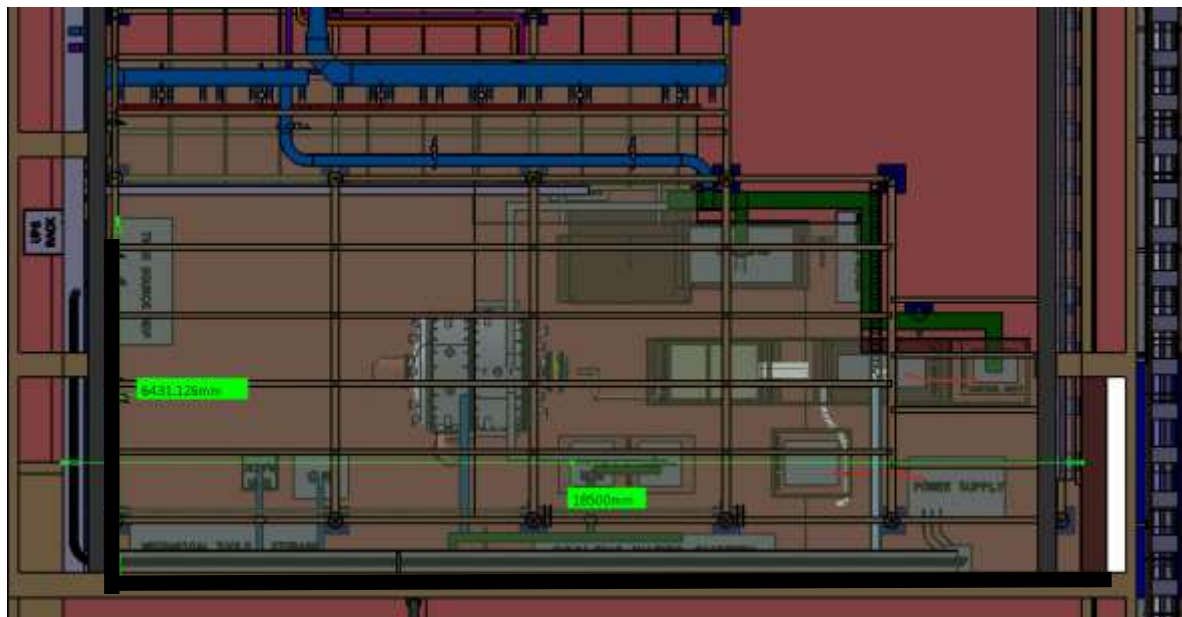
Plan view of cable route inside DNB lab, ITER India Lab Building highlighted in dark
